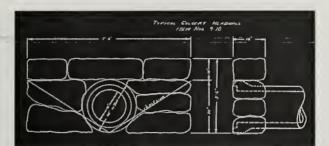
Culvert detail for an 18-inch RCP with a headwall, from Jordan Pond/Eagle Lake Road, 1935. (U.S. Department of Agriculture, Bureau of Public Roads, Project 3A1, Sheet 3 of 22, 1935)
